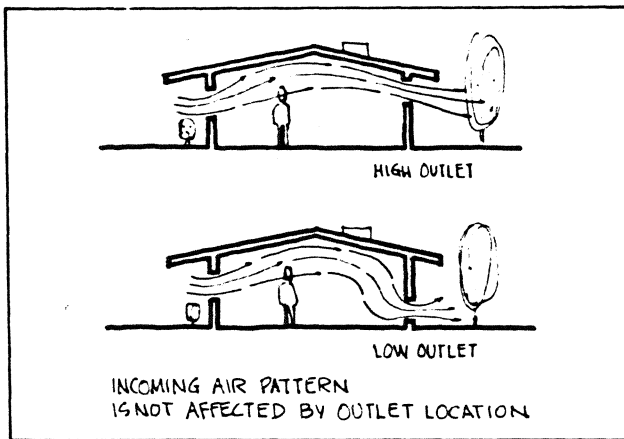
The location of the outlet opening does not significantly affect the incoming air pattern
